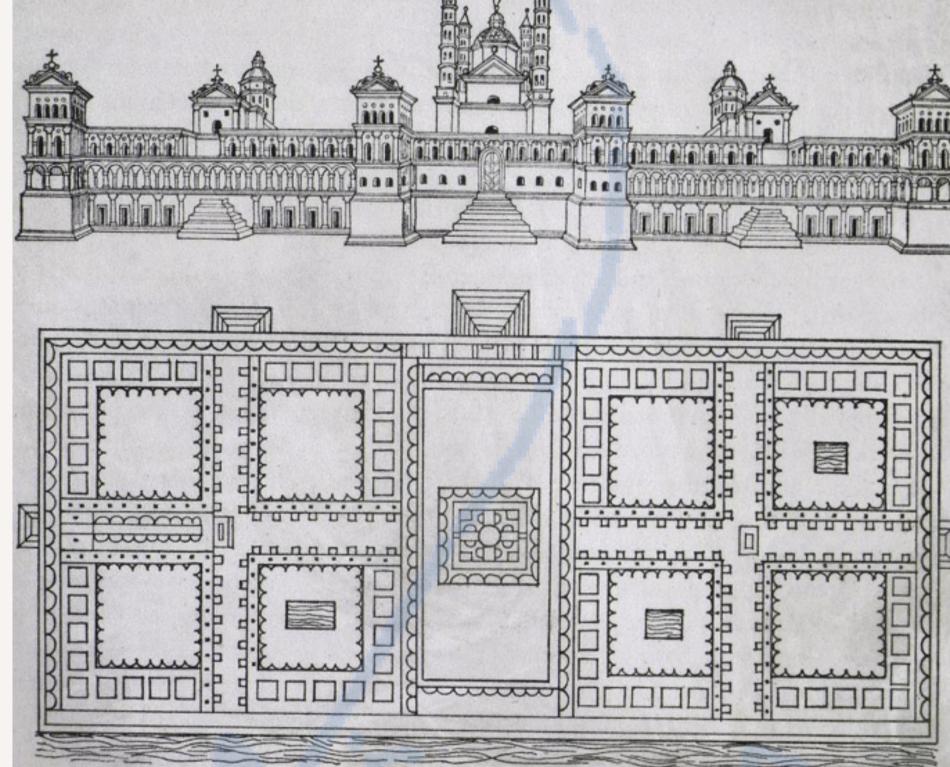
Ground plan and elevation, Ospedale Maggiore original design by Filarete (Antonio Averlino), Milan (Web Gallery
